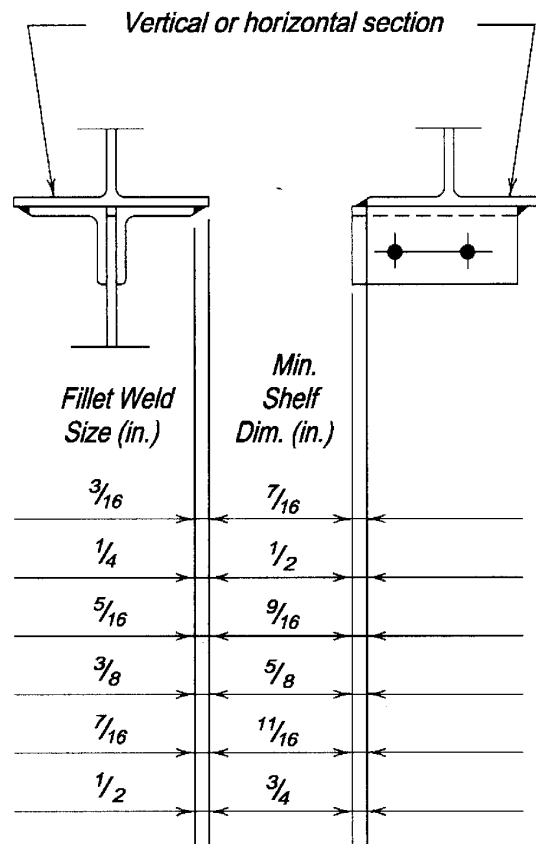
Recommended minimum shelf dimensions for SMAW fillet welds.
